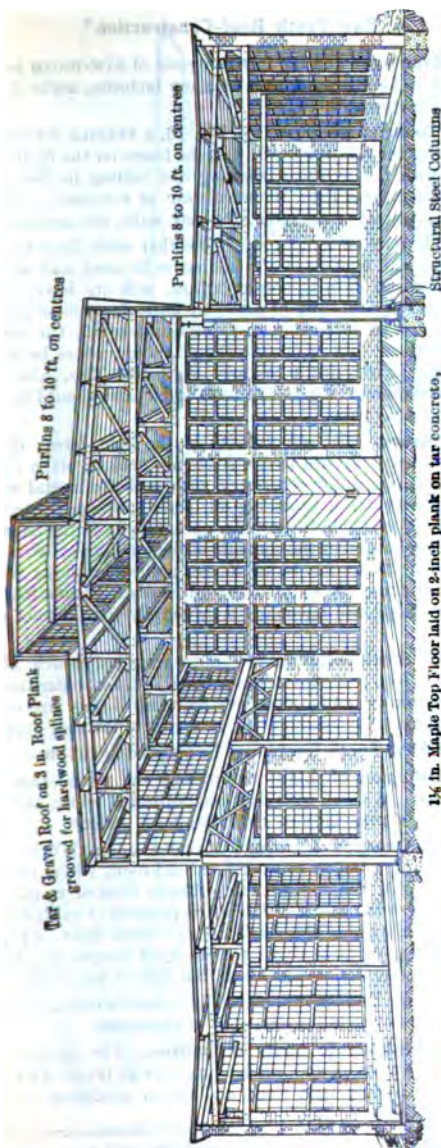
One-story Work-shop. Roof-boards on Purlins
